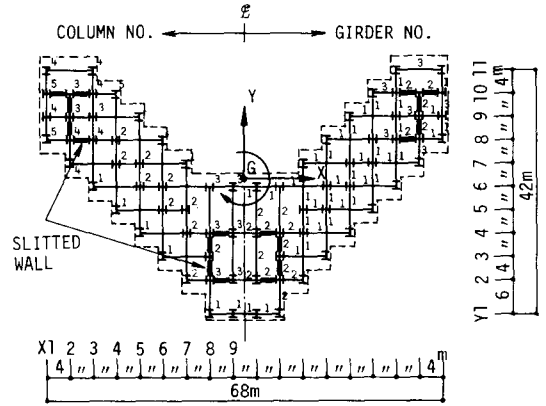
TYPICAL FLOOR FRAMING PLAN
